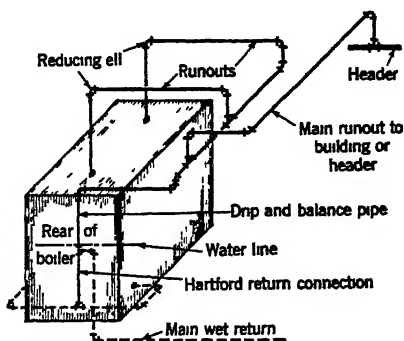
APPROVED METHOD OF BOILER CONNECTIONS
